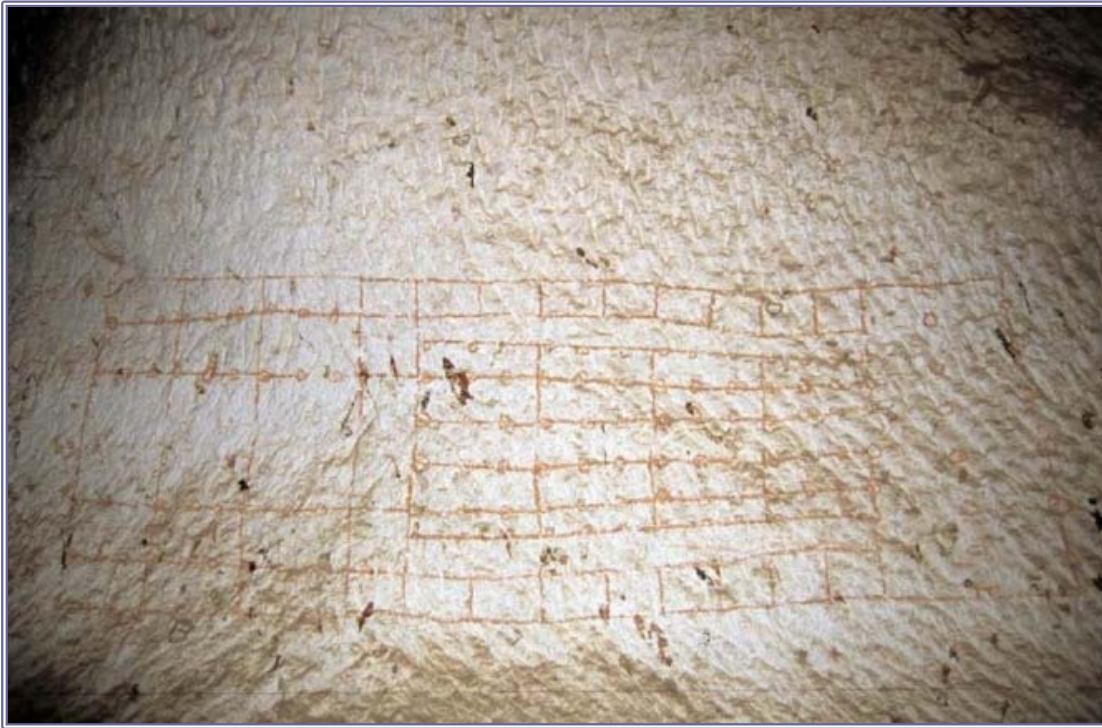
Plan of an unknown temple painted on a support pillar in the limestone gallery quarry at Gebel Sheikh Said (no. 33 in Table 1 and Figure 2). Plan is 1.6 m wide by 0.5 m wide.
